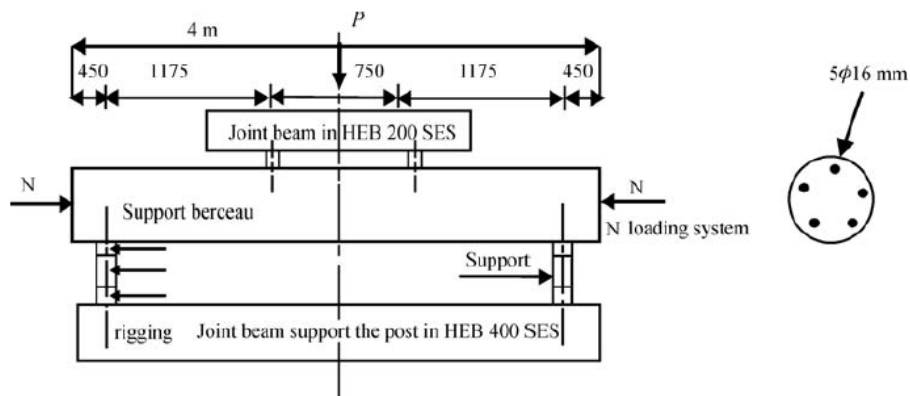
Composite bending test for reinforced concrete pile with circular cross section Zhan [24]
